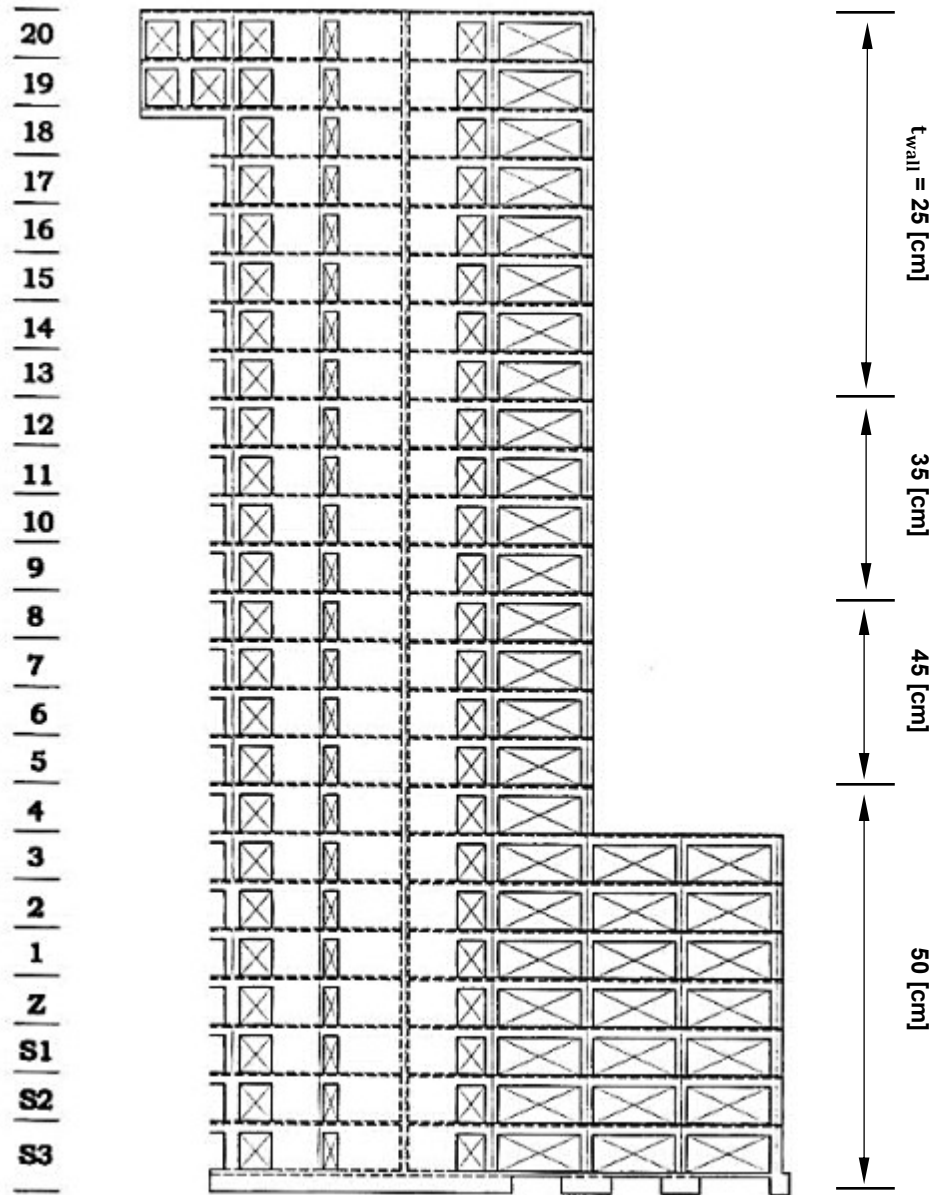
7 and 3-axes elevations (dimensions in the figure specify walls thickness in each story). CChC Building [5].
